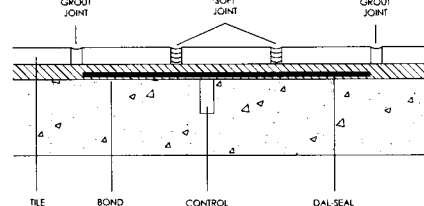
JOINT BRIDGING - CROSS SECTION
